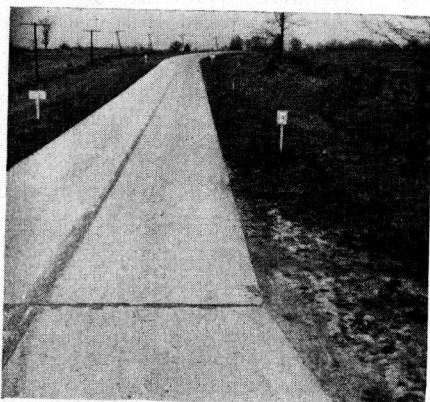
A View of S.R. 3, Constructed with Good Aggregates in 1935. The pavement has no joints and the average transverse crack interval is over 100 ft.
